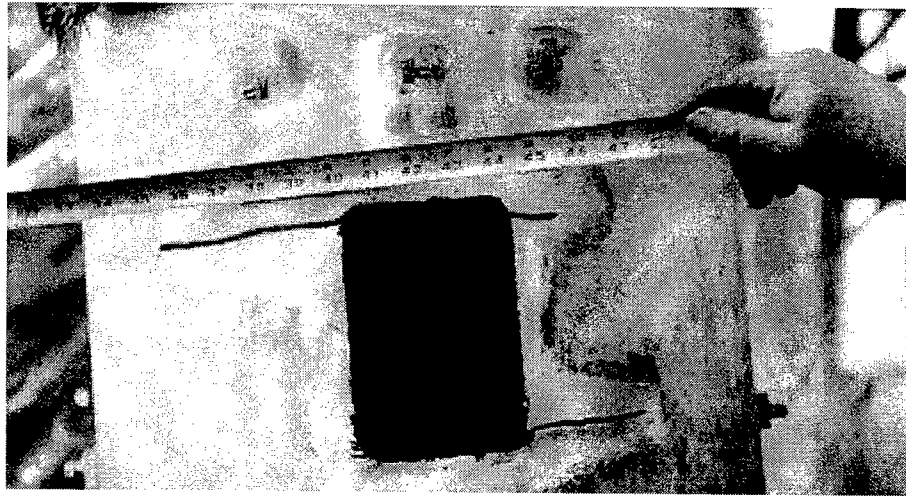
Location of cracks at the conduit hole for Specimen AB1
